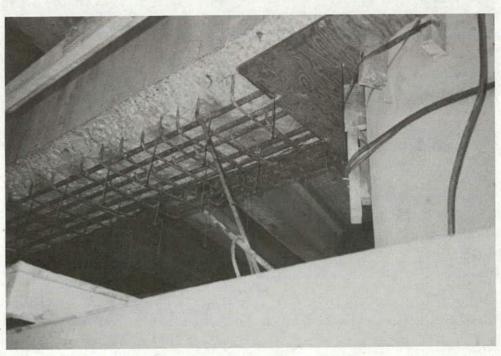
Use of snap form ties to support wooden forms for pier cap soffit.
